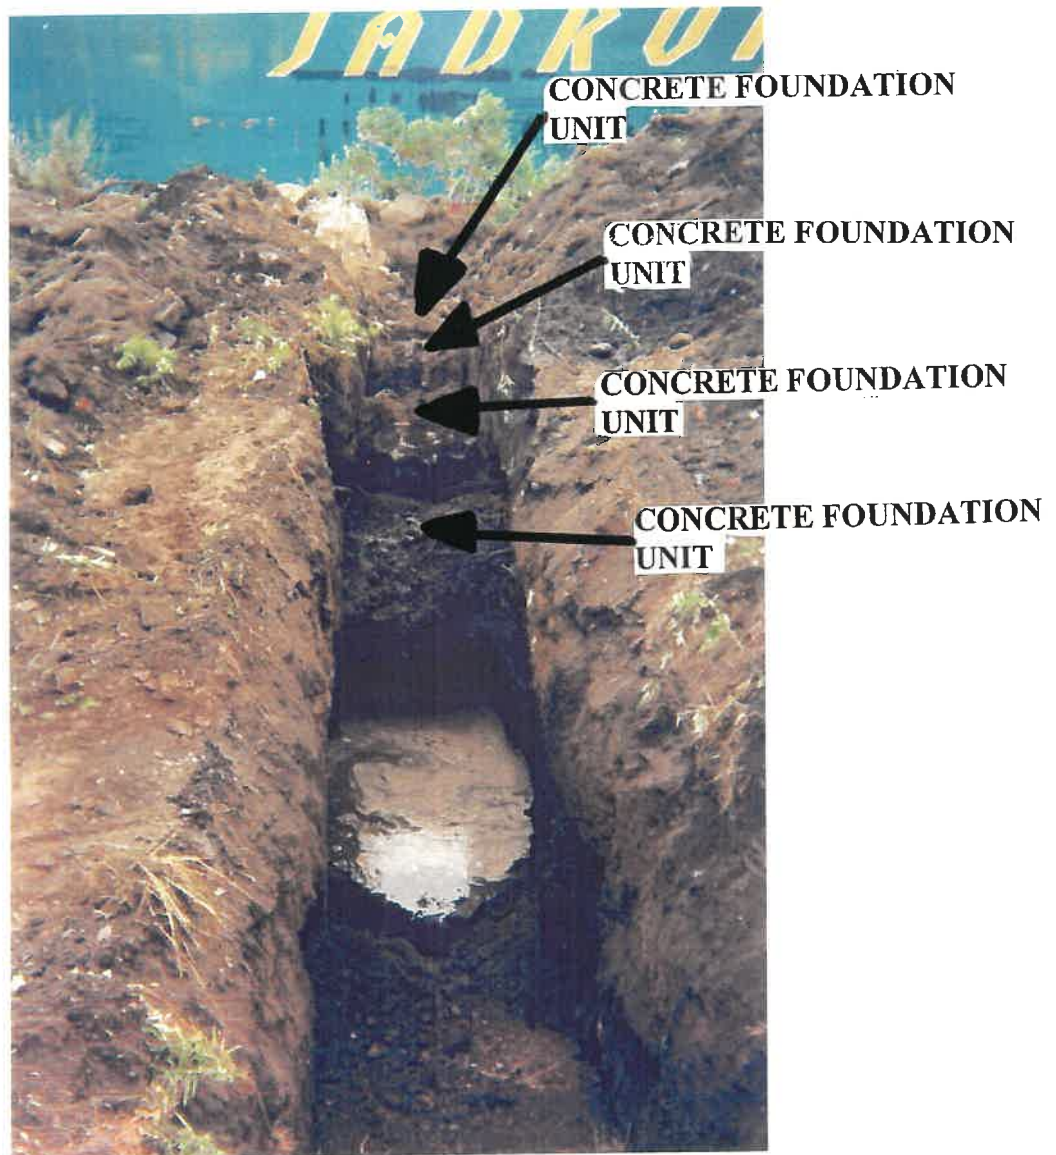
View of test trench #2 (TT-2) standing approximately 38' east of boring WC-10 looking east. Note the numerous concrete foundation units.
